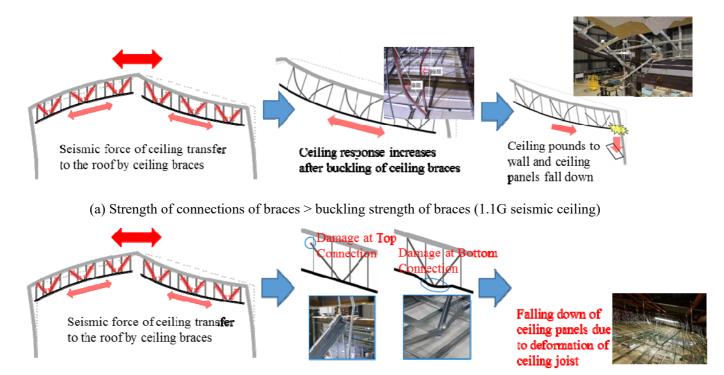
shows failure mechanism of seismically designed ceiling. If ceiling has stronger strength of brace connections than buckling strength of braces, ceiling pounds to walls and falls down due to increment of displacement resulting from buckling of ceiling braces as shown in Fig. 11(a). On the other hand, if ceiling has stronger buckling strength of braces than strength of brace connections, ceiling panels fall down due to deformation of ceiling joists resulting from damage of brace connections as shown in Fig. 11(b). As described here, it is clear that failure mechanism of ceiling depends on relations between strength of brace connections and buckling strength of braces.
